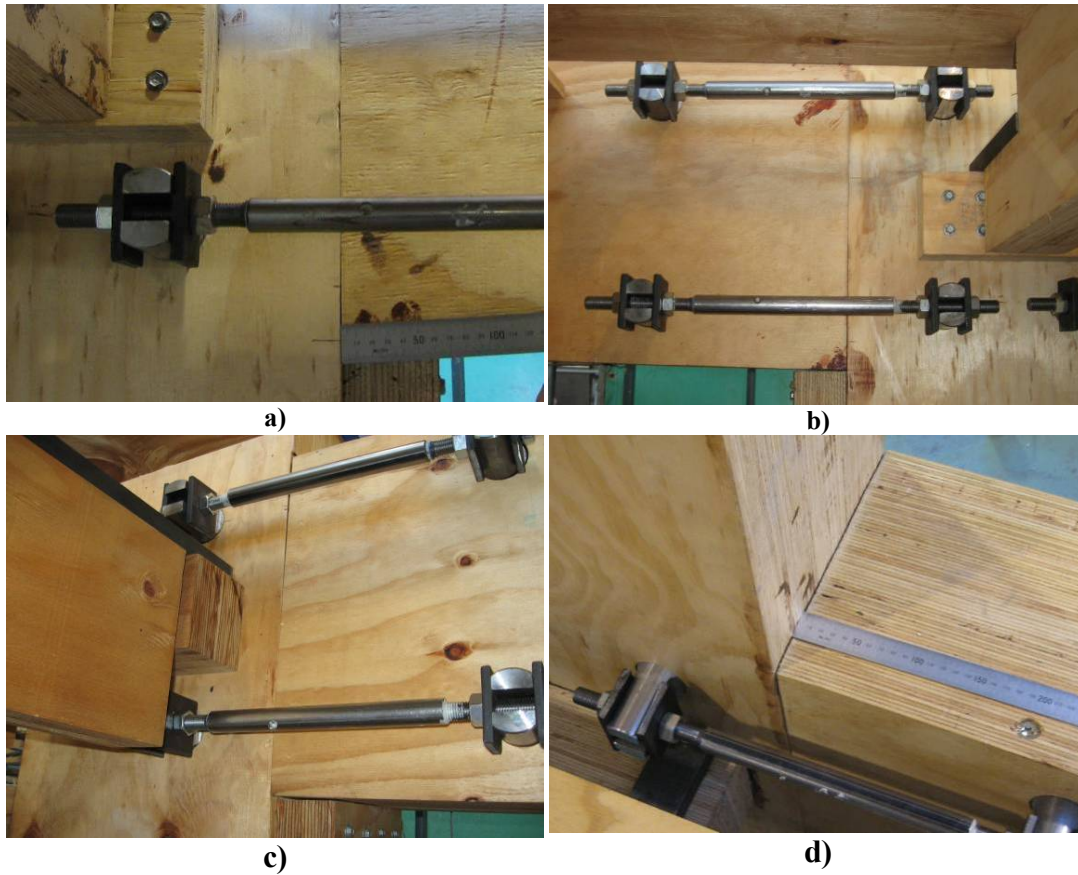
L3 BC connection deformation at 2% Drift a) & b) S column c) & d) SE column
